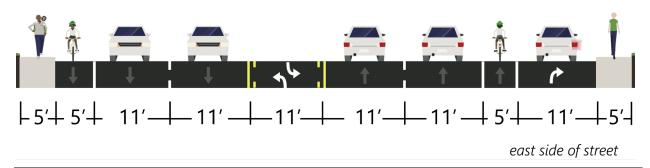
Typical Cross Section, Segment 4: 18th Street to 28th Street (looking north)
